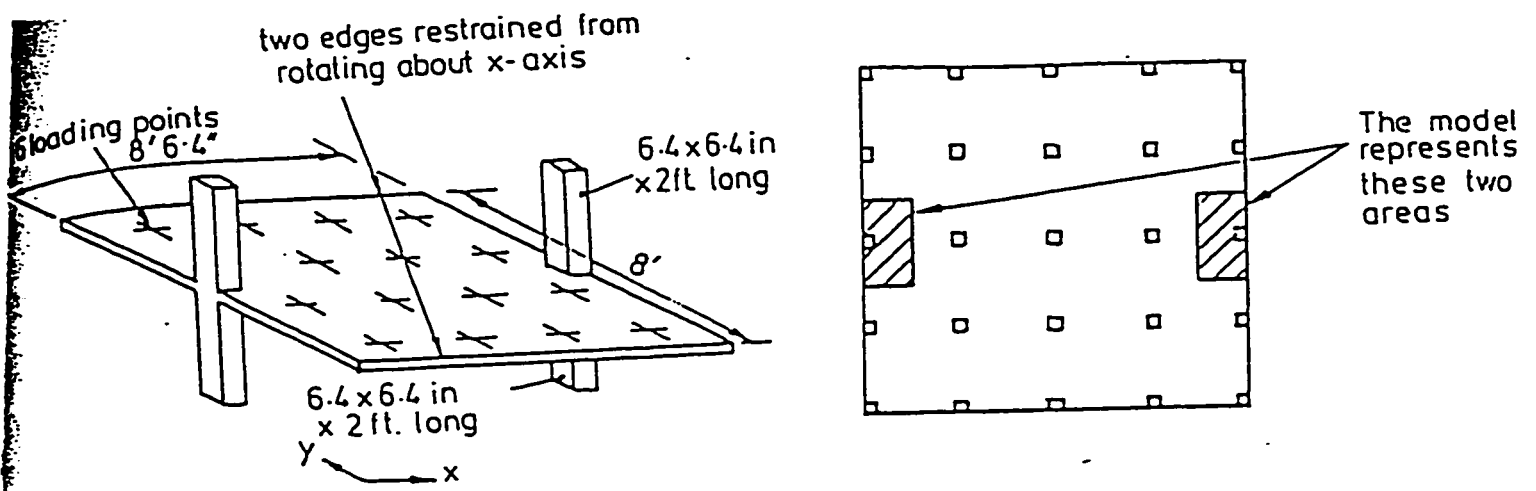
Plan and sketch of the models used in Long's experiment
